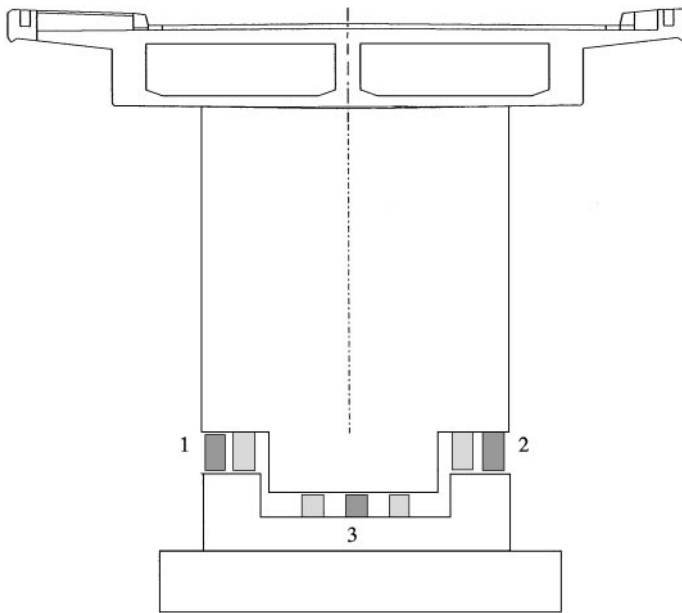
Installation of settlement system at pier Koppigen. ■ Jack; □ Steel plates.
